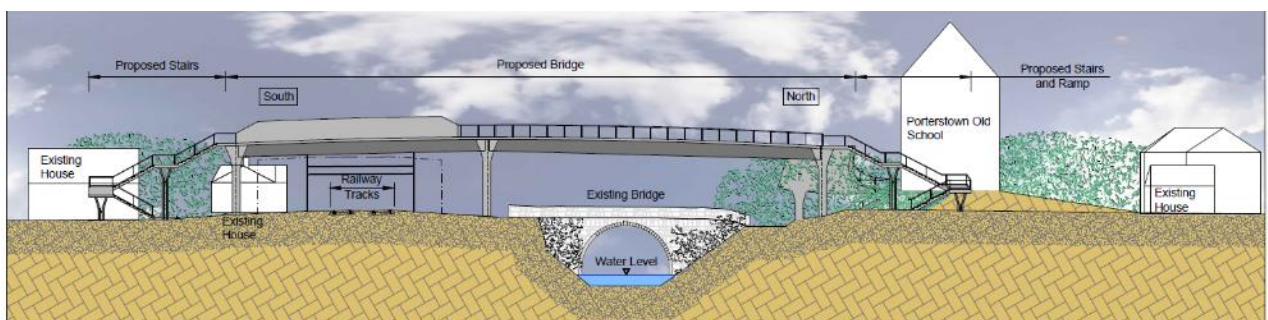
Porterstown Emerging Preferred Option: Cycle Bridge - Sectional Elevation
